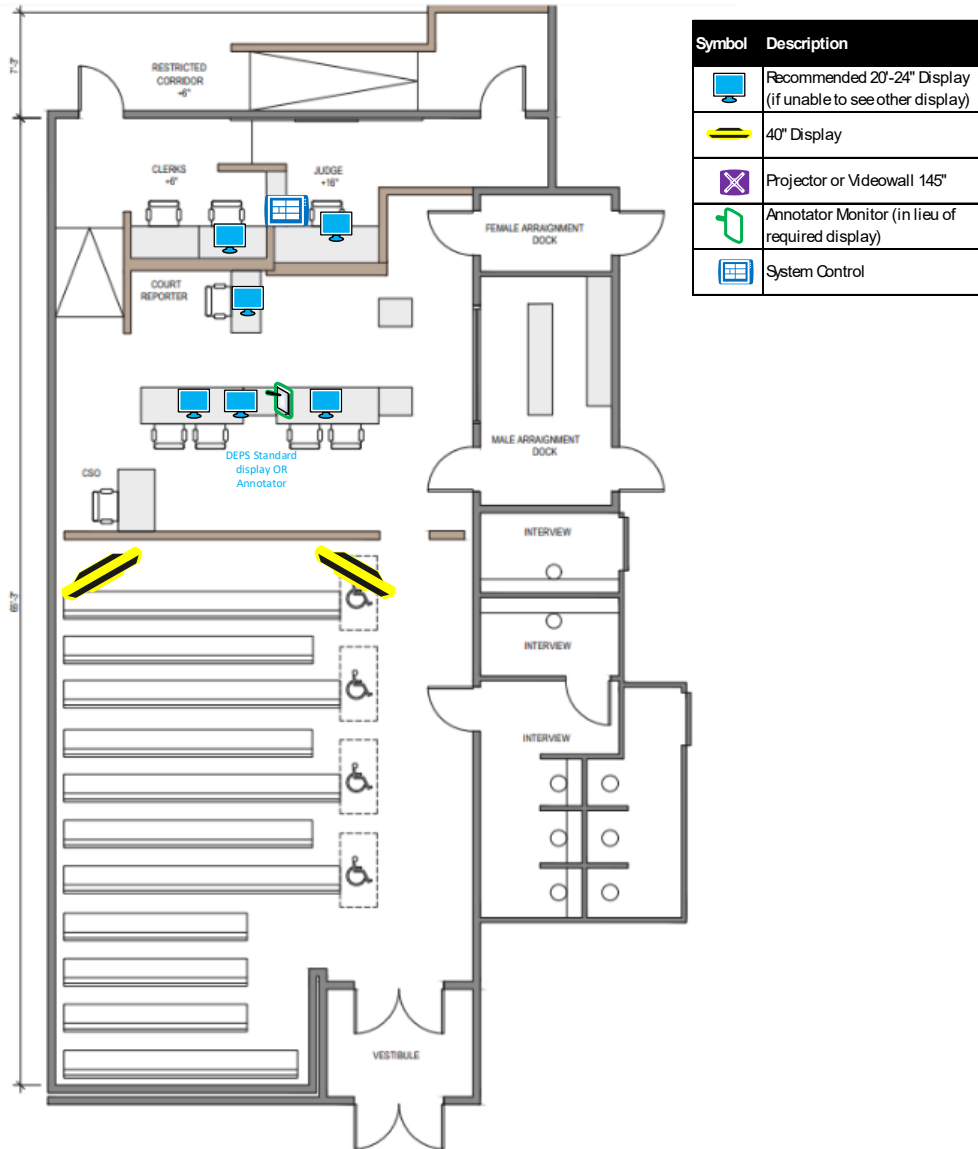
San Diego Central Courthouse, Arraignment Courtroom—Center Bench
